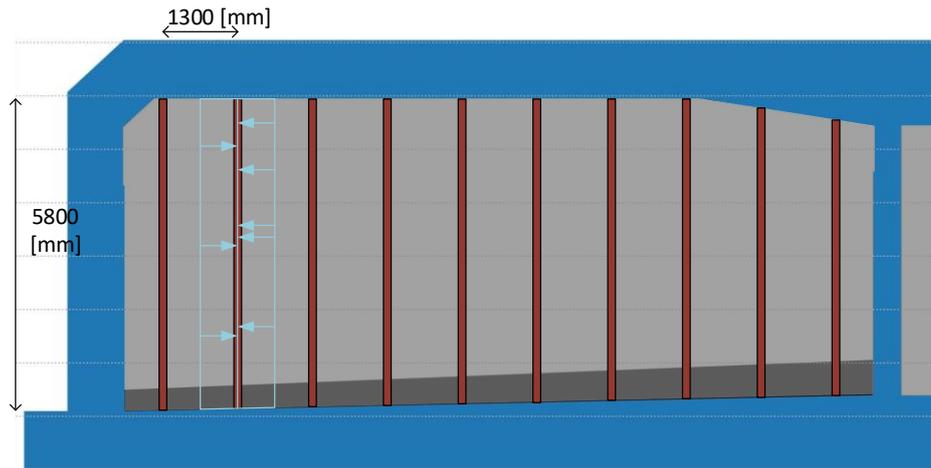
, LOAD DISTRIBUTION ON BULKHEADS, CROSS-SECTION VIEW
